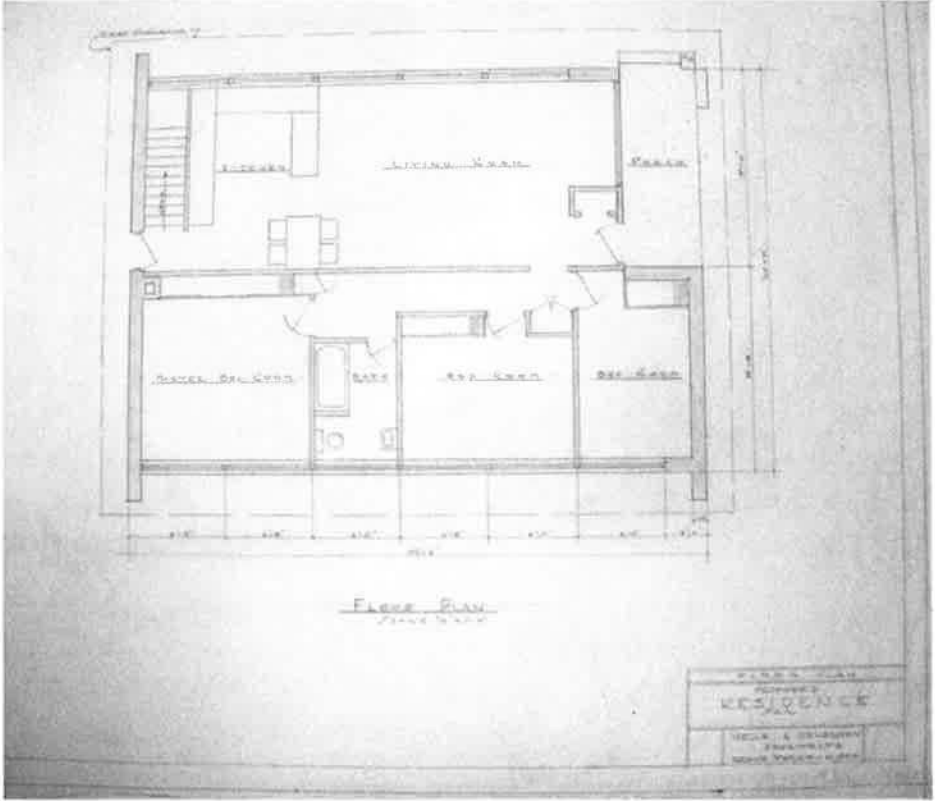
Wells-Denbrook Architectural Office main floor plan, original 1954 residential concept
